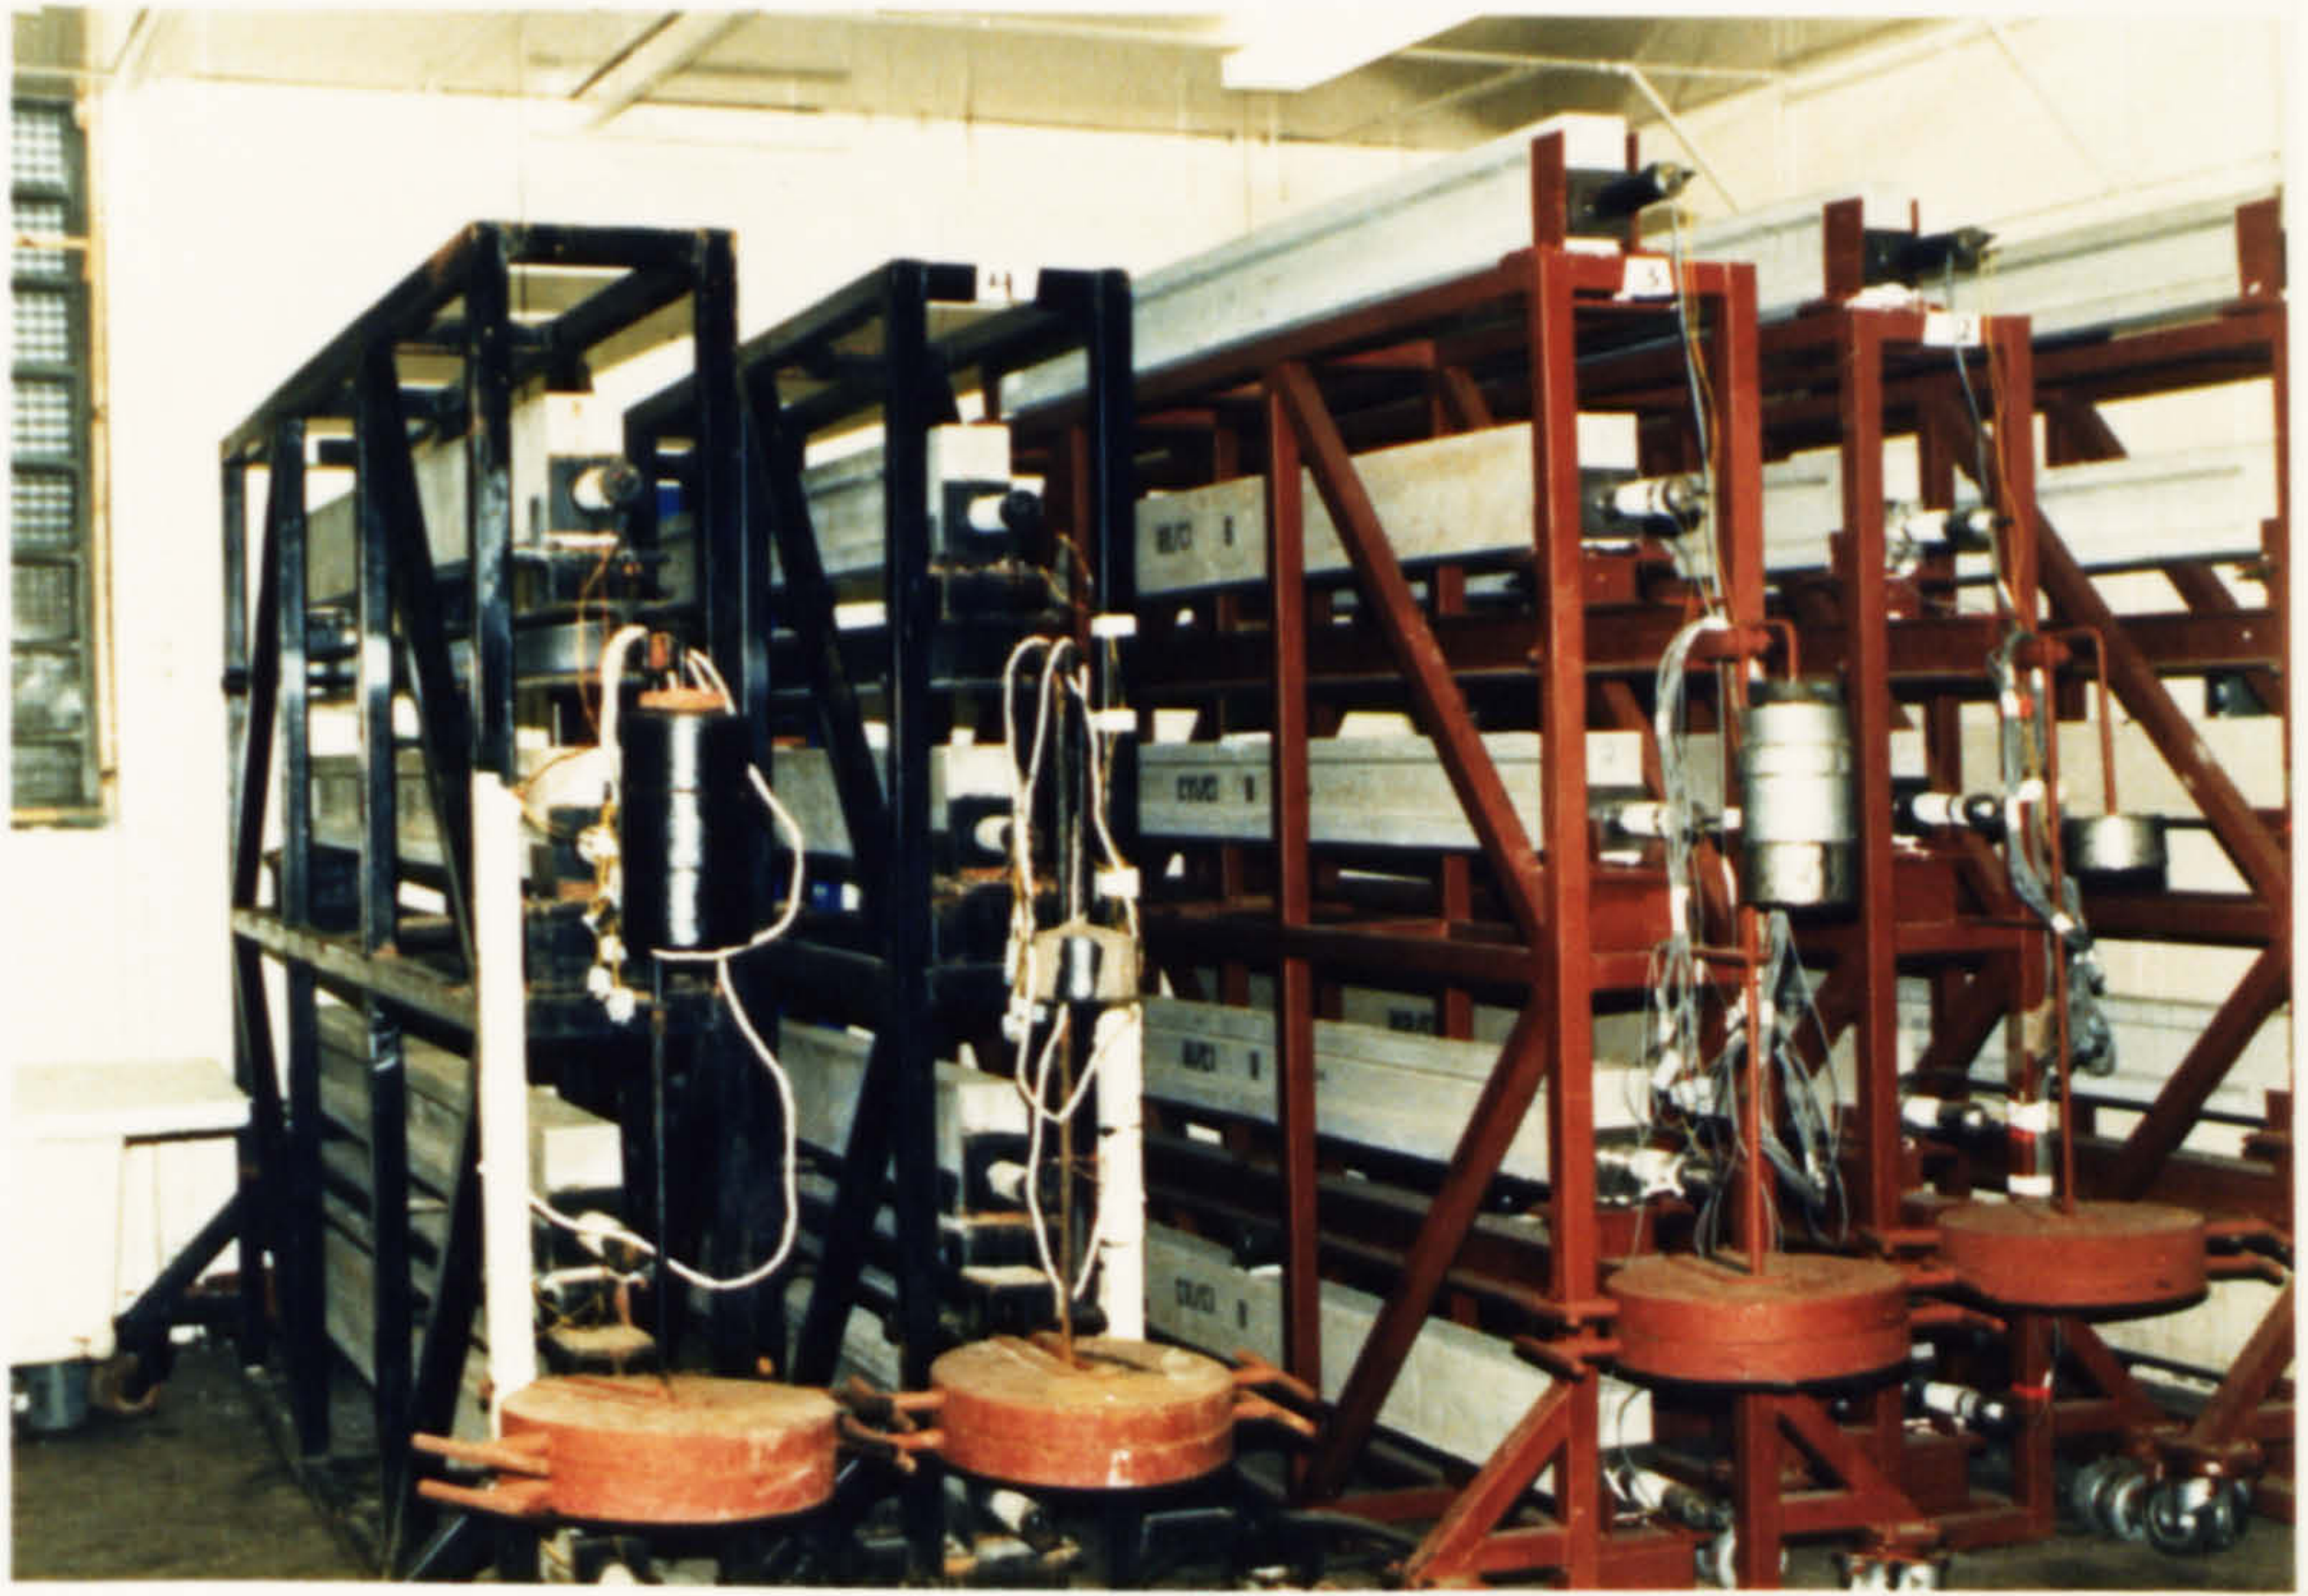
General view of beams loading rigs inside control room of 20°C and 65% R.H.
